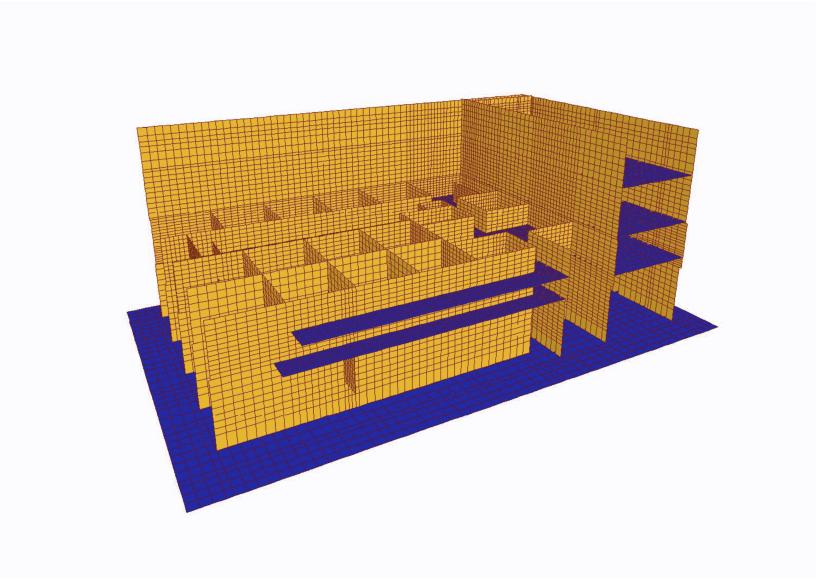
H.3-7 Radwaste Building SAP2000 Model (South Wall, West Wall, Roof and El. 35'-0" Slab Removed)
